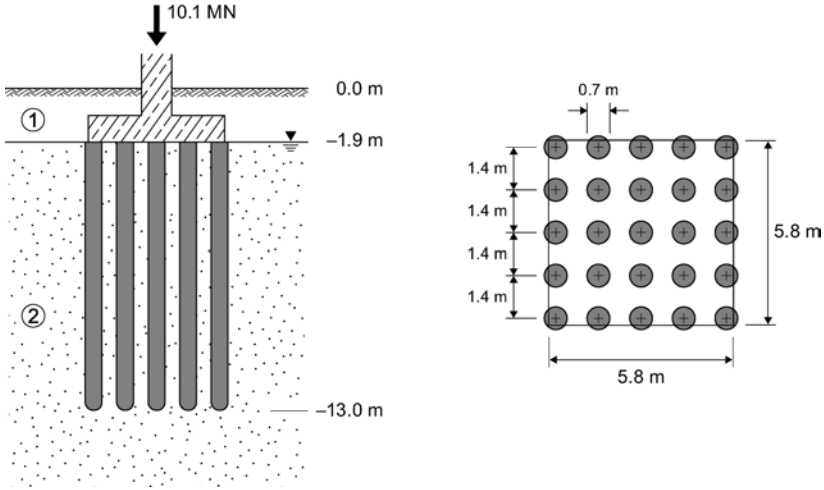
Cross-section and plan view of single footing founded on 25 stone columns
